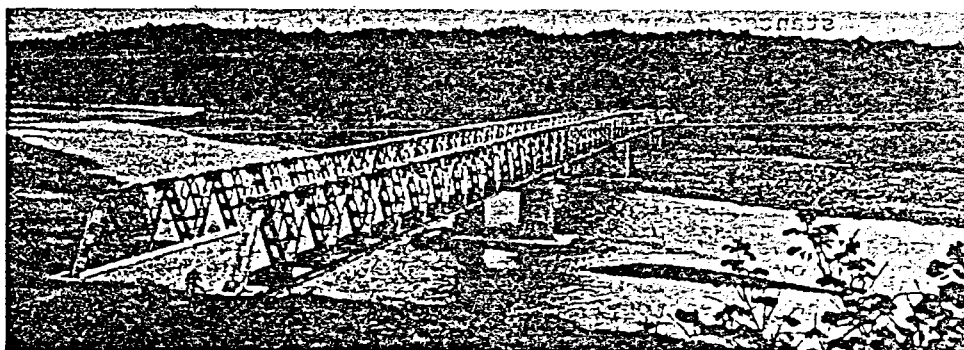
Four span continuous Callender-Hamilton Type B15 Bridge across a flood plain in Nepal. This Bridge was cantilever erected due to the tendency of the river in the area to flash flooding.
